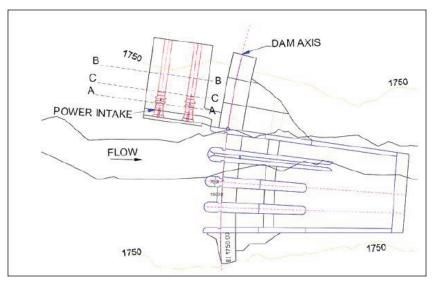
General layout of Mangdechhu Project with intake position A-A, B-B and C-C
